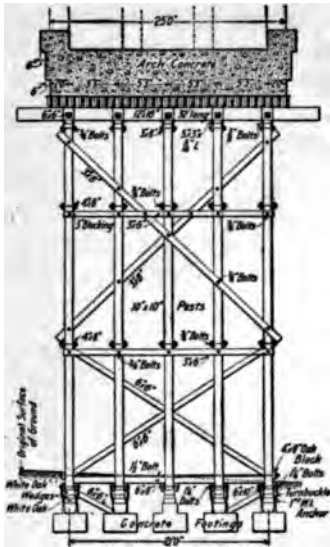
Transverse Section of Center for Piney Creek Bridge.
